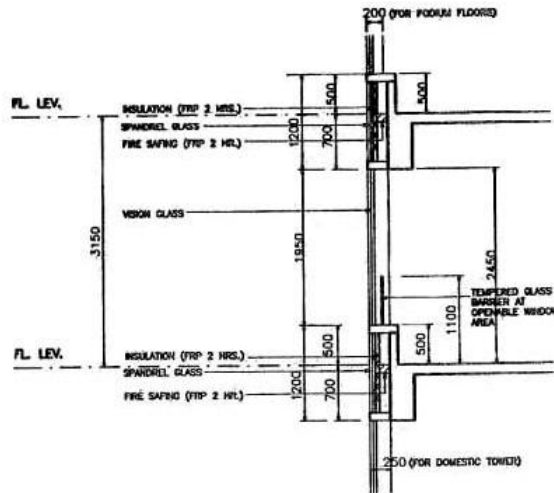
Section through curtain wall (DLN Architects & Engineers 2001d)
